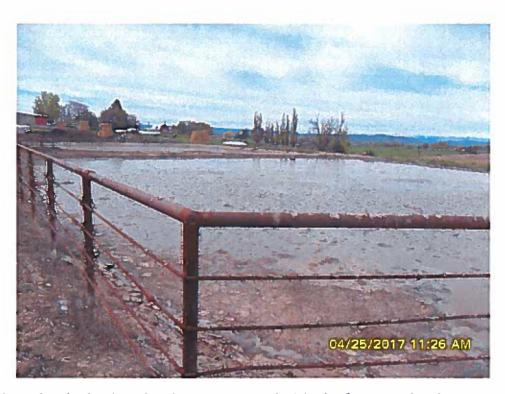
Southerly view showing storage pond #1 in the foreground and storage pond #2 in the background. Camera photograph #SAM 2747.
